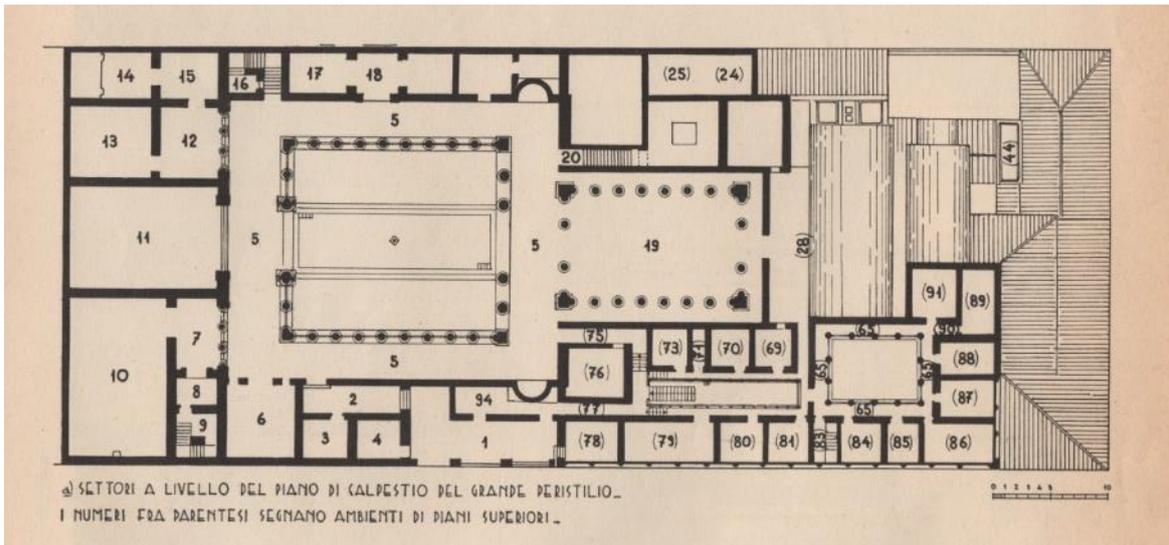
Ptolemais, schematic plan of the reconstructed building called "Palazzo delle Colonne" (from PESCE 1950).
